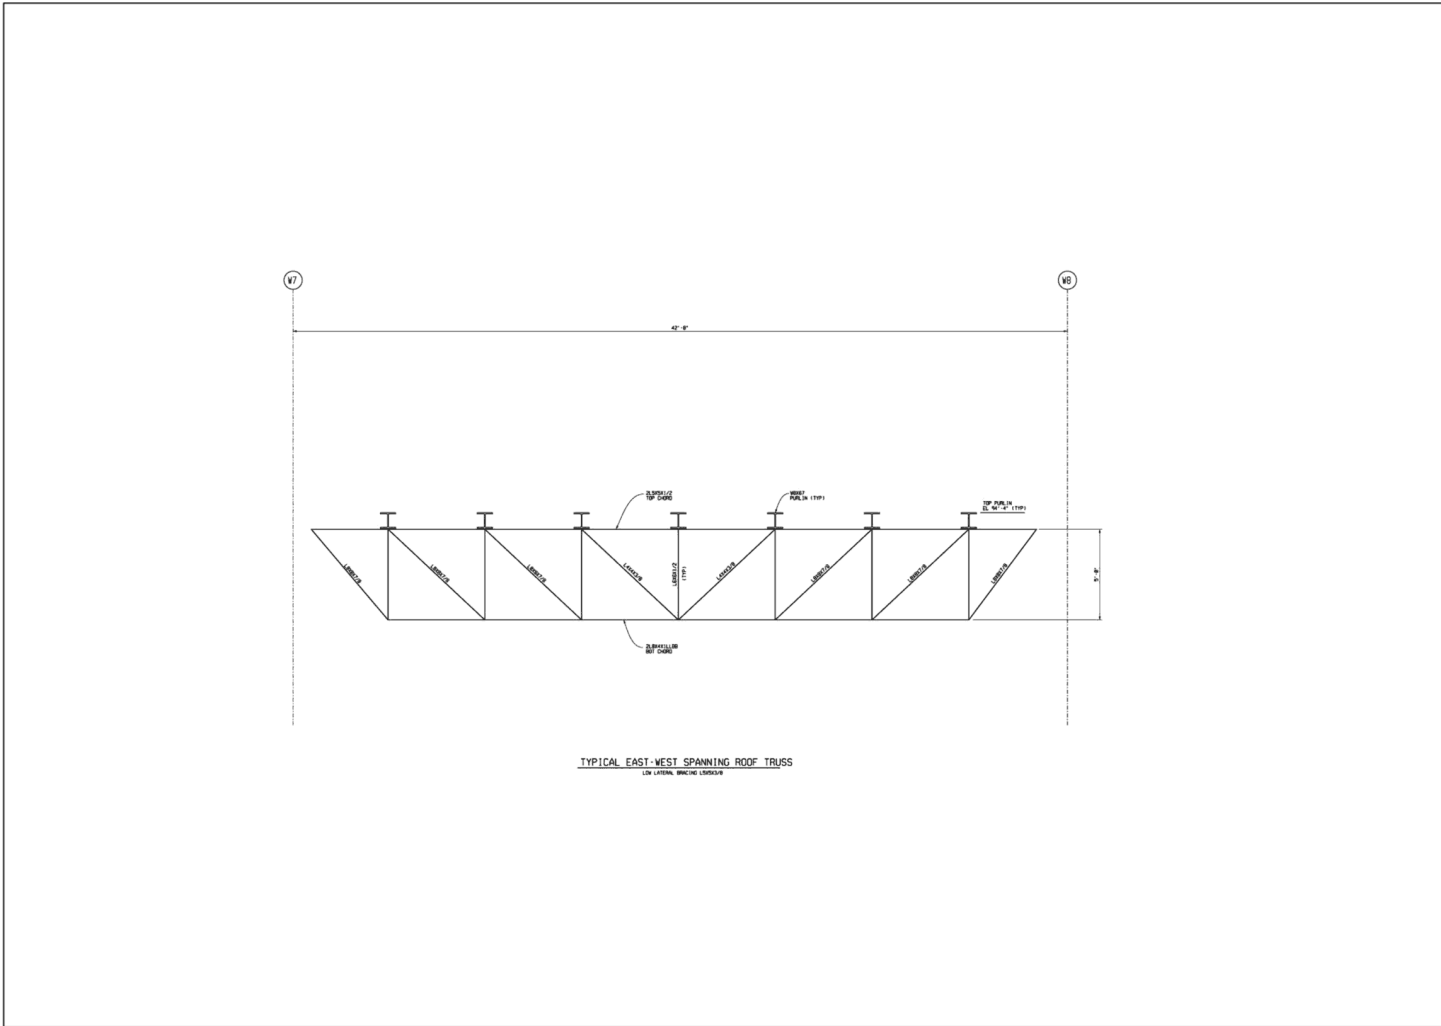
H.3-48 Typical East-West Spanning Roof Truss Between Column Lines W7-W8 (Elevation View)
